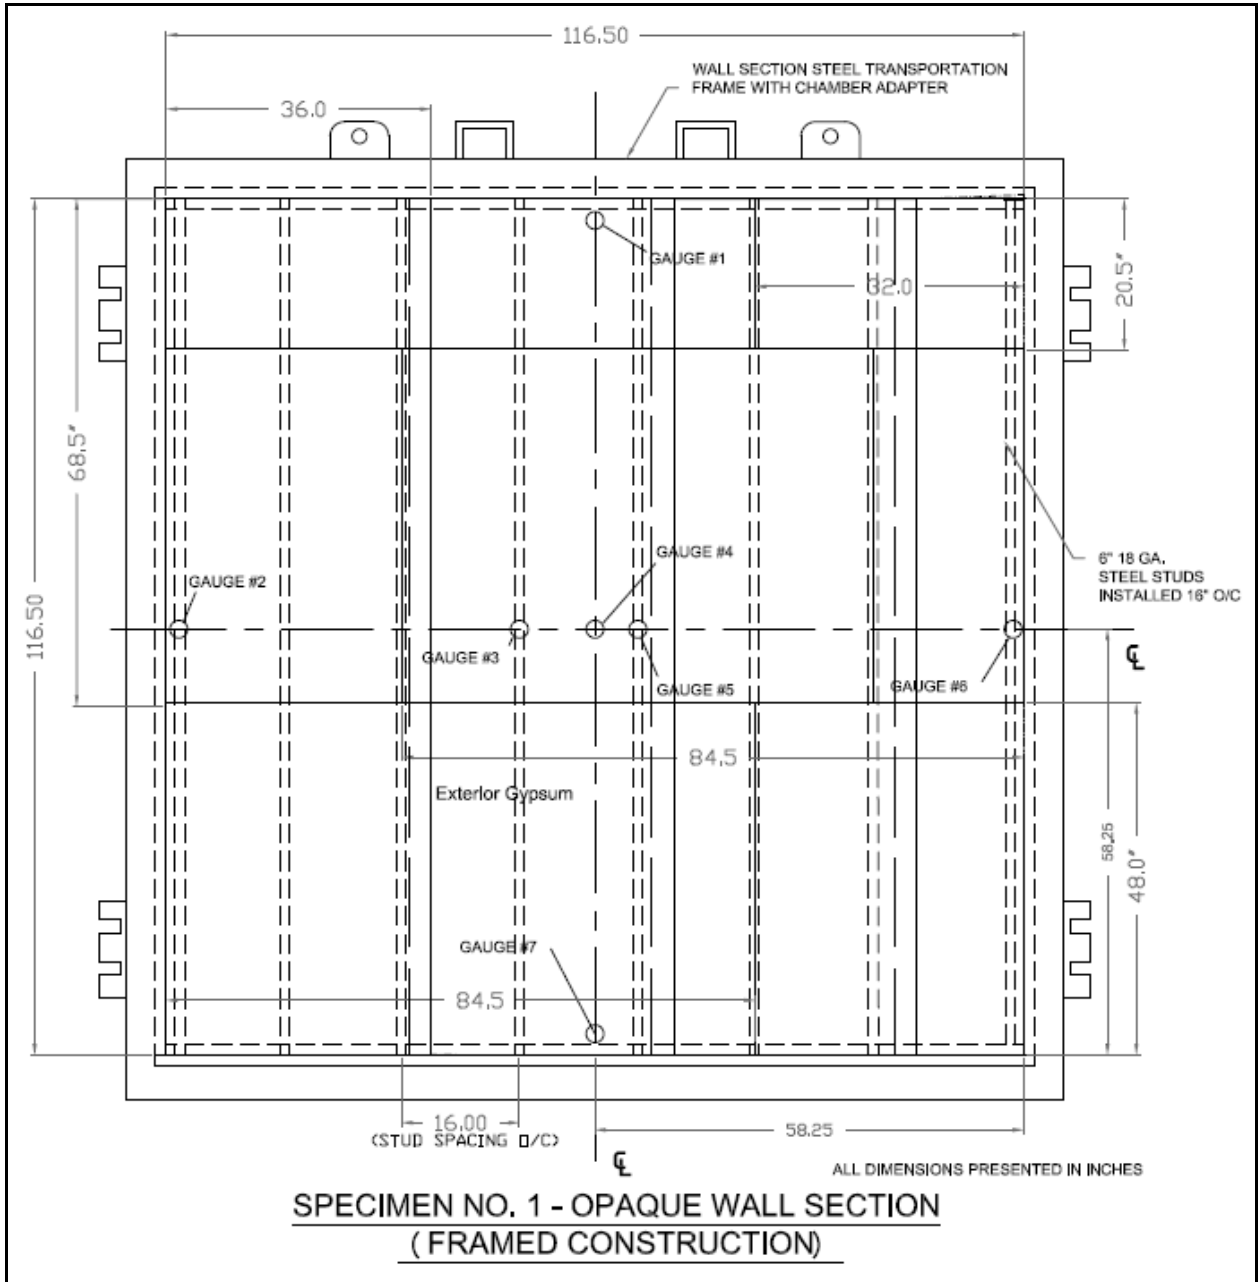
Element Specimen 20-06-B0040-SS-OP-1 Gauge Locations
